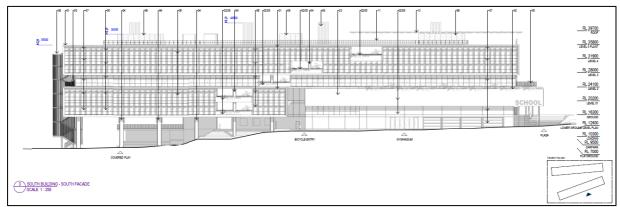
| Southern elevation of the building as seen from the TAFE Green (Source: Applicant's RRAI 2020)
